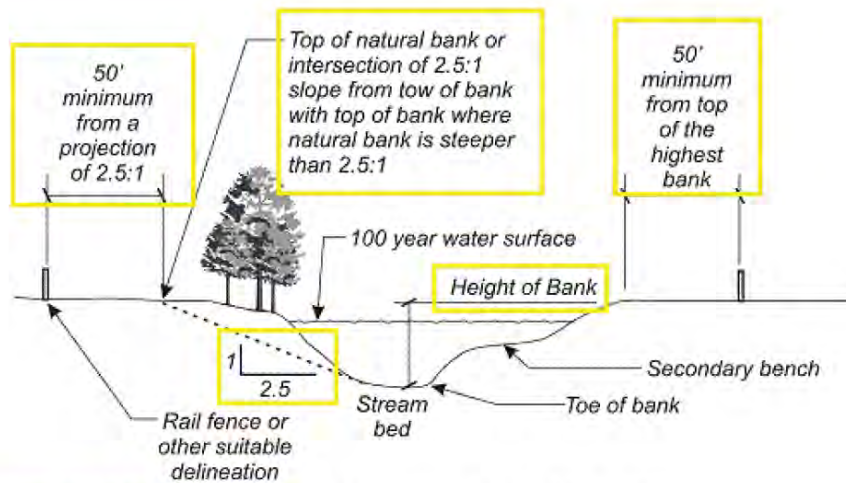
Setback with defined bank (see exceptions Section 20-30.040.D.4.)
